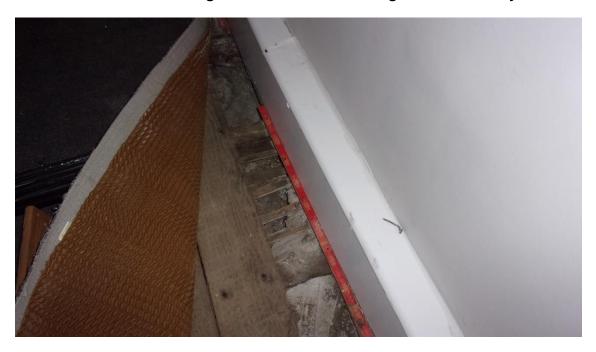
Floor Boards and Joists Exposed in Bedroom 3
